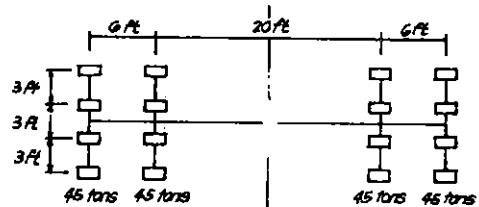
The wheel positions of the BS, HB loading in plan
